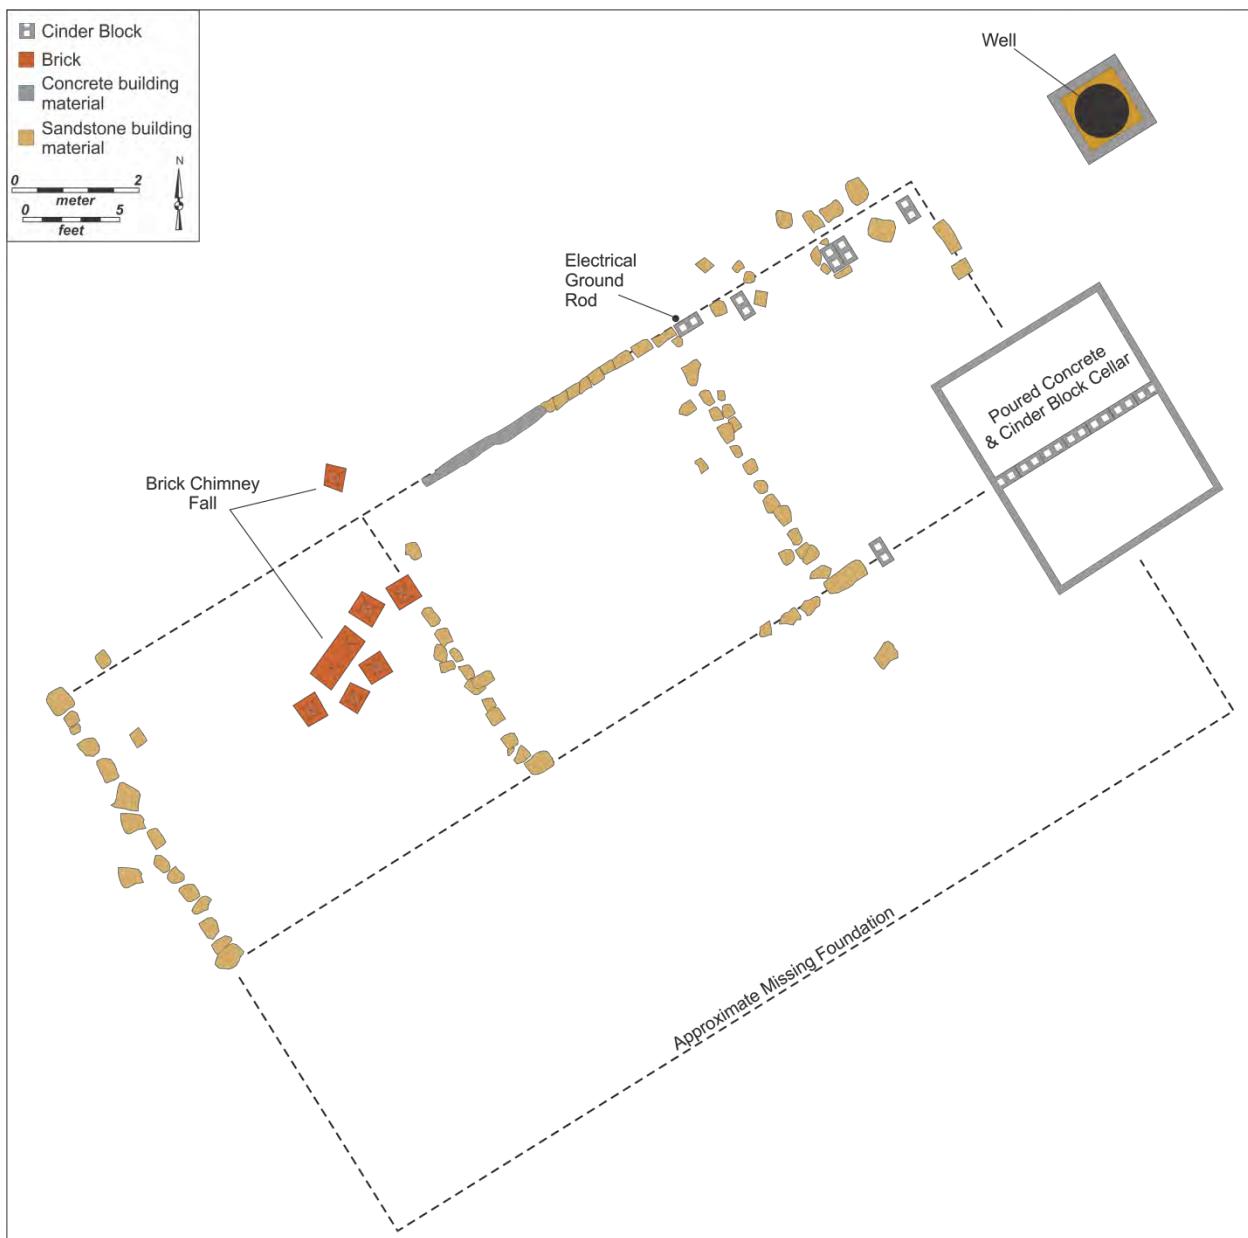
Illustration of the house foundation at Mechling Farmstead (33Pk318).
